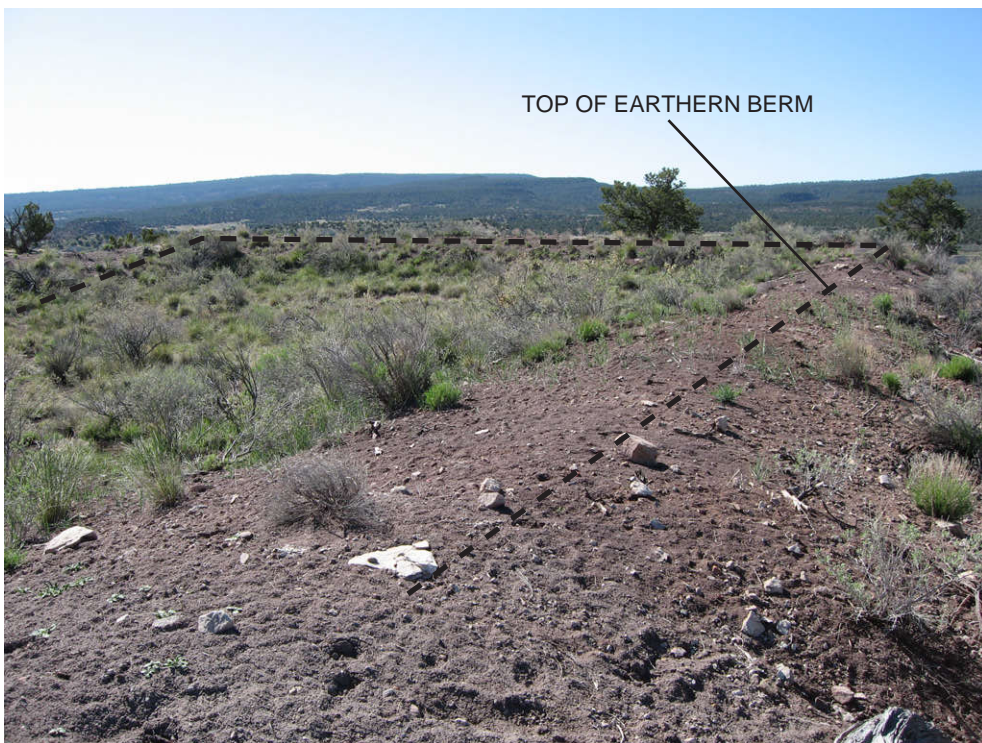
AOC 30, Igloo Block D, looking south at typical open storage area (Y-site).
